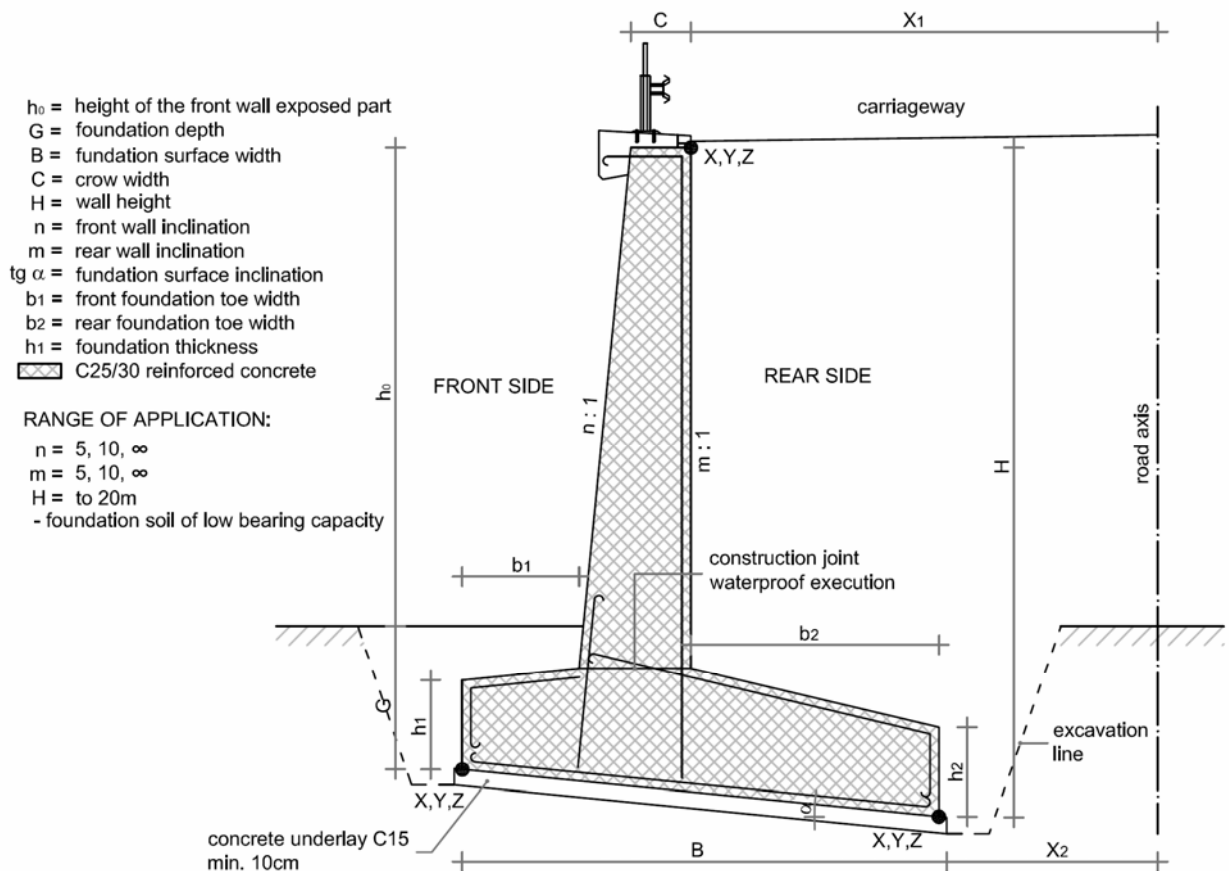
Angular reinforced concrete gravity supporting wall, including staking out data
